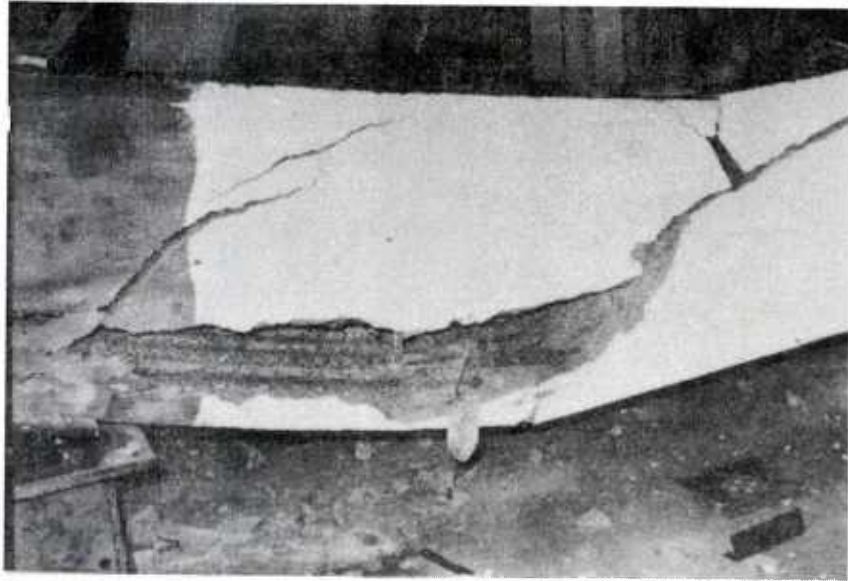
Diagonal Tension Failure of Beam Without Stirrups or Fibers
